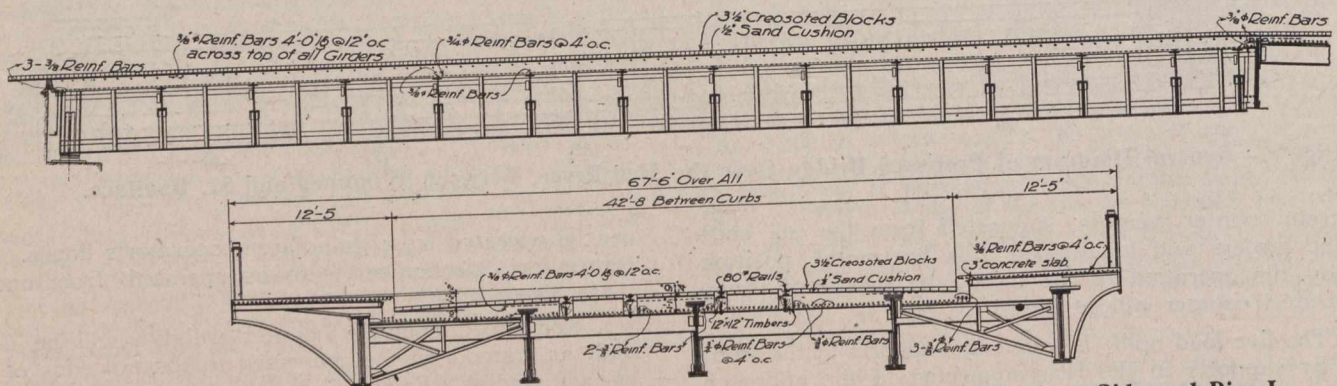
Longitudinal and Cross-sections of Span Between Abutment on the Winnipeg Side and Pier I.
